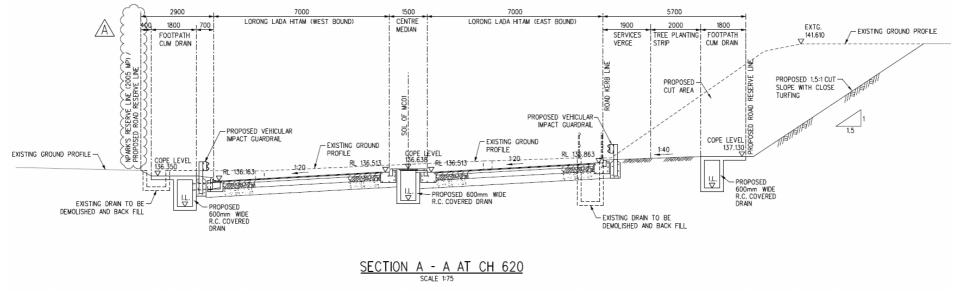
Proposed Construction cross-section for CH 620 (Source: BCA, 2022)
